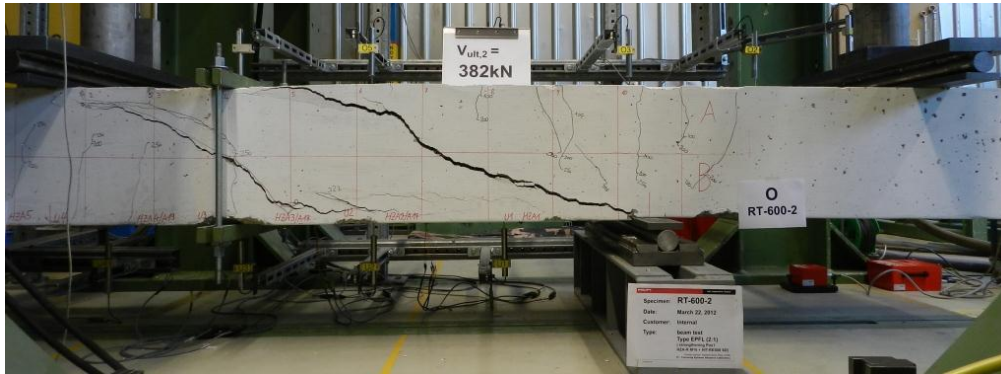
Specimen RT 600-2 at second failure; first crack was braced after full opening
